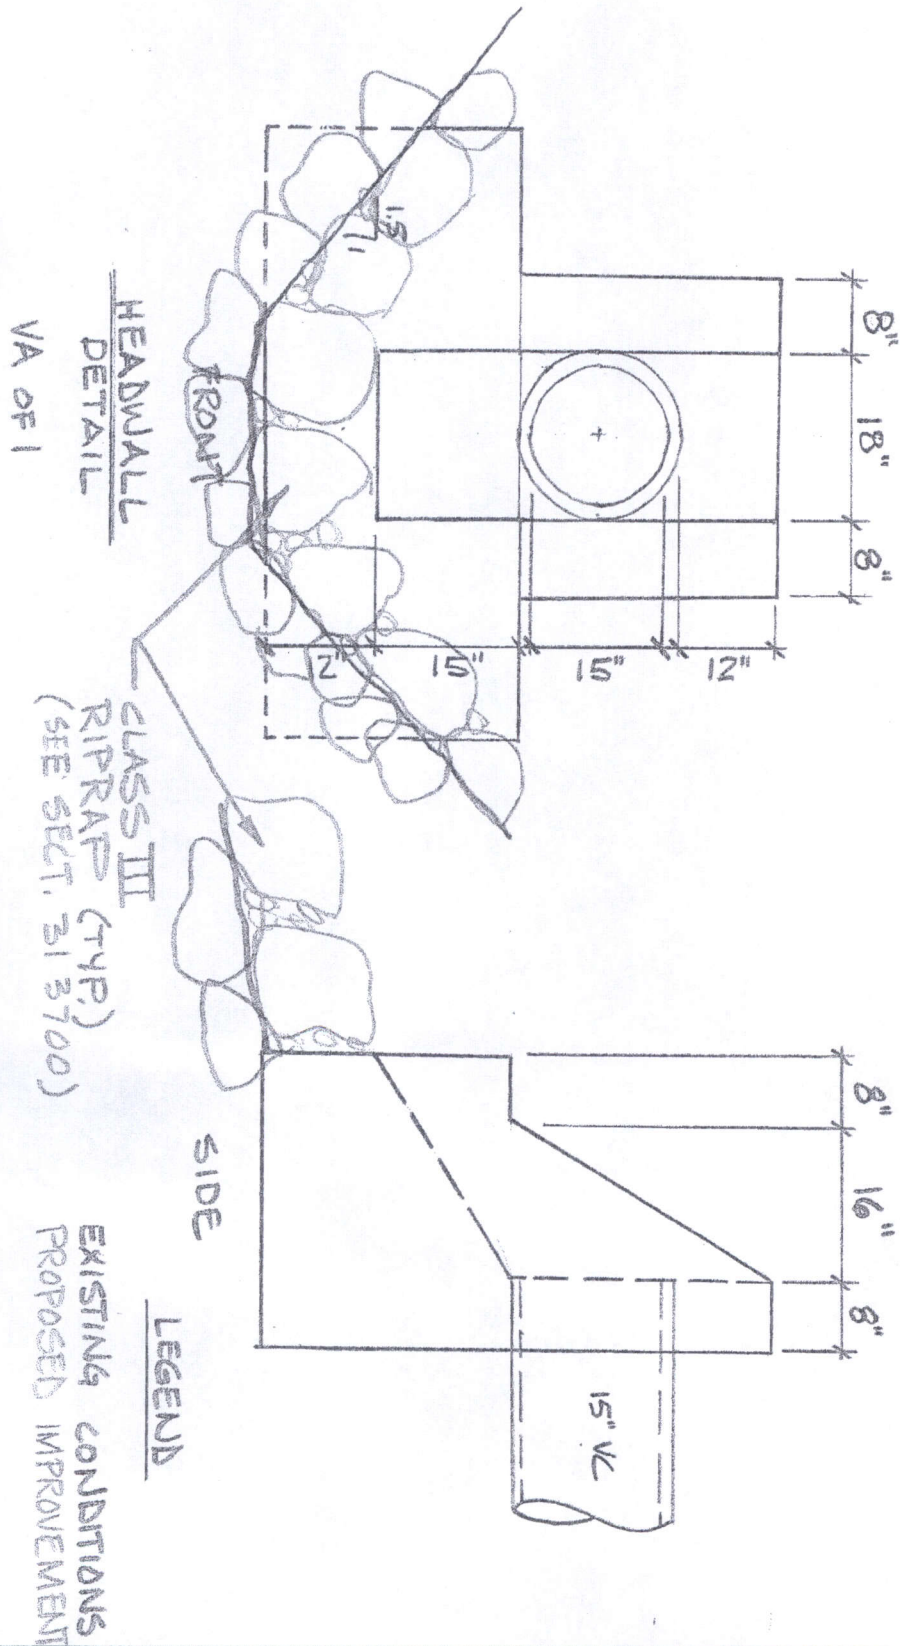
EXISTING HEADWALL AND RIPRAP REPAIRS
